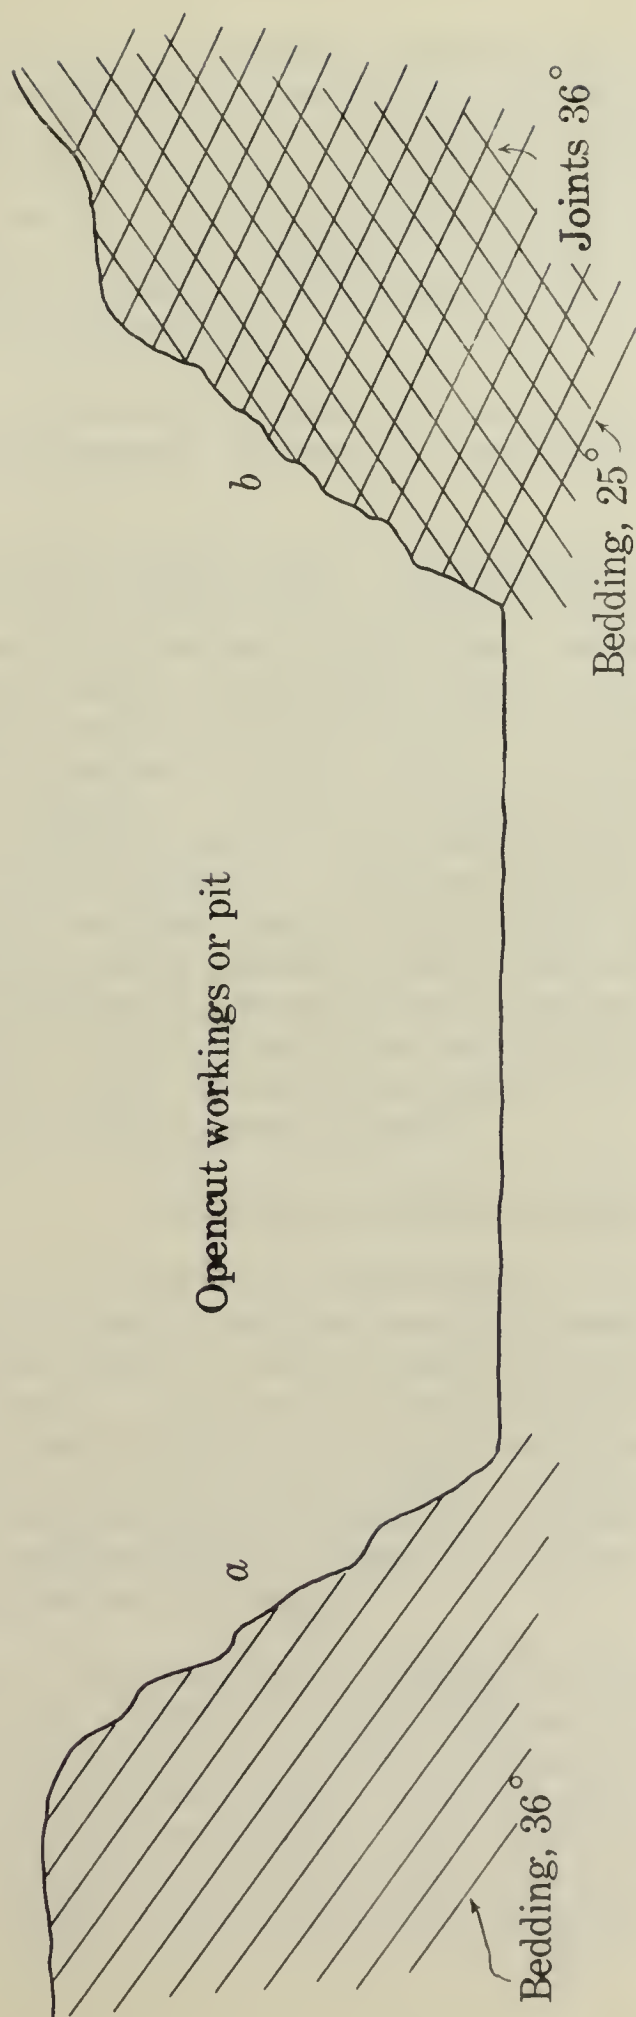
Vertical section through opencut workings, showing arrangement of bedding and joint planes. Bedding is usually more prominent than joints, and controls ground movement if the beds dip toward the workings; otherwise they have little effect and joints or slips become the controlling factors. On the *a* side of workings bedding controls ground movement, on the *b* side the joints control, therefore the angle of draw is similar on both sides, as the angles of bedding on one side and of joints on the other are the same. This is an actual case, although not drawn to scale
